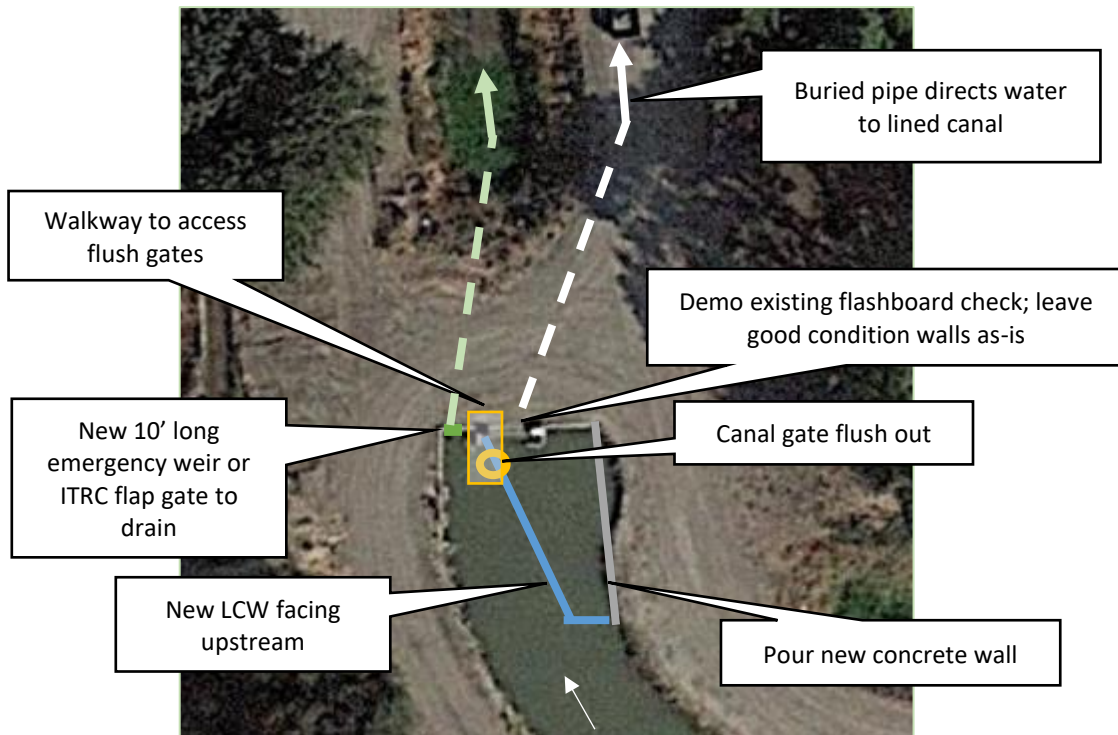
Laguna Canal check structure improvement concept; plan view overlaying the 9th Laguna Canal check near Shain Ave and 4th Street South
